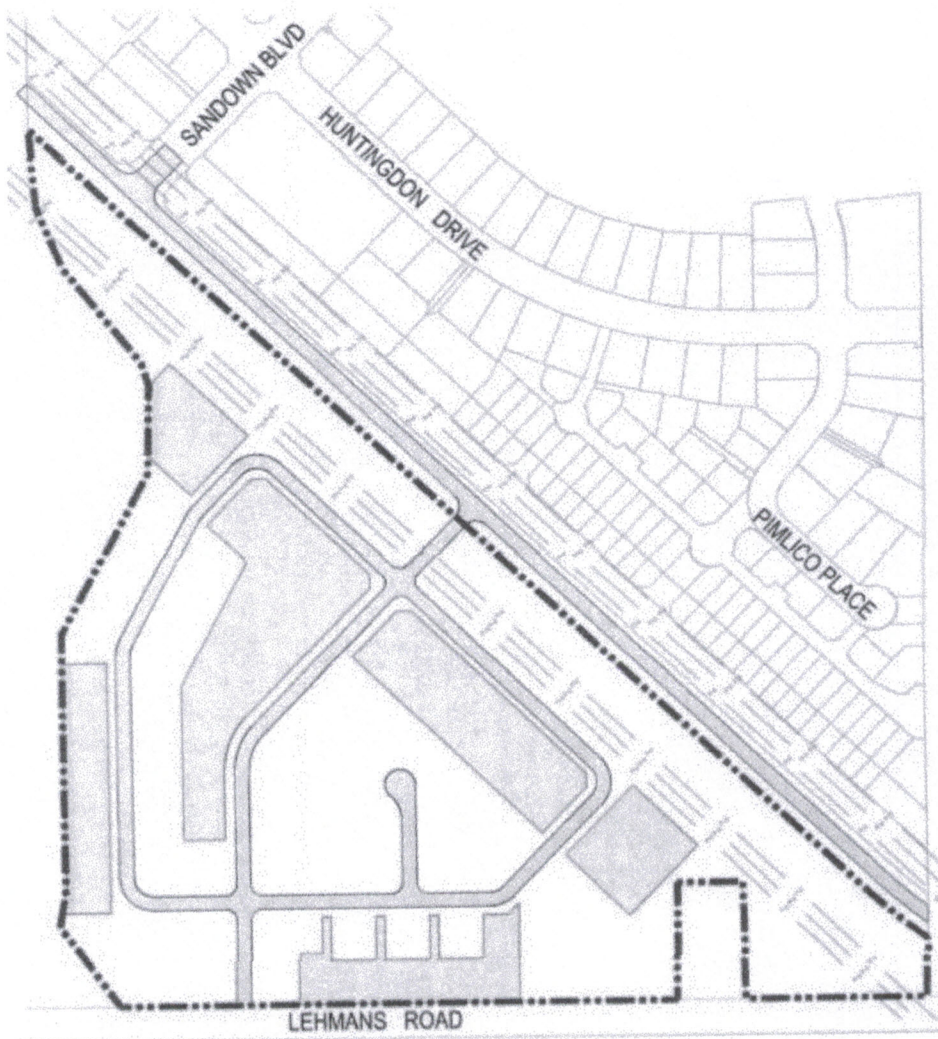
Location plan in relation to adjoining Arlington residential subdivision
